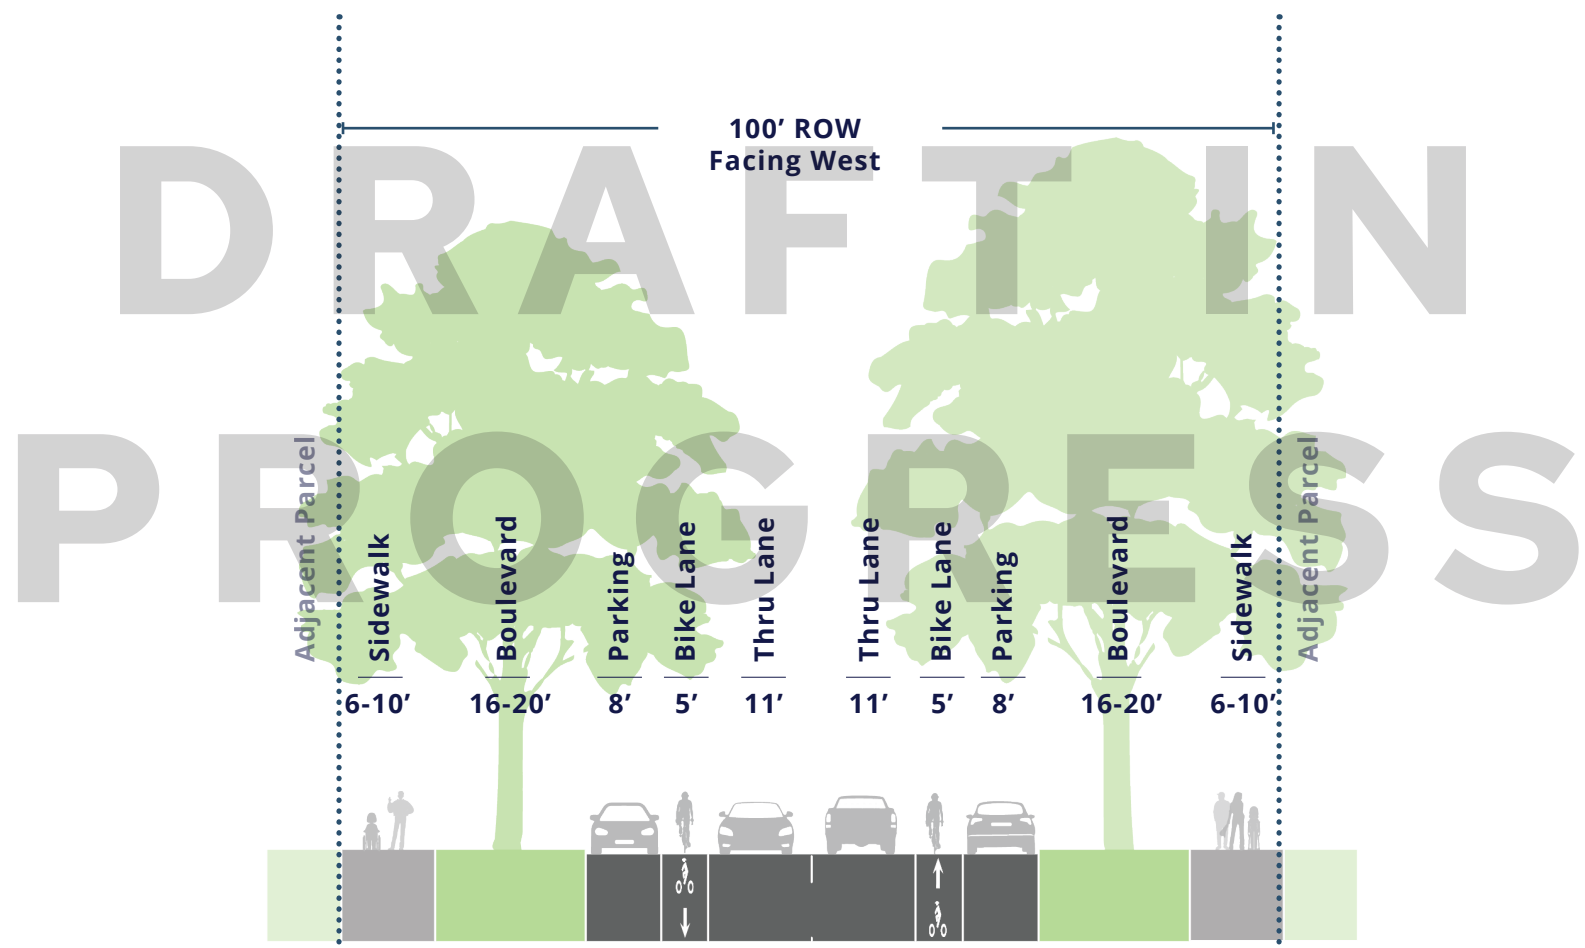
| Typical cross-section through Summit Ave in Segments D, E, and F
